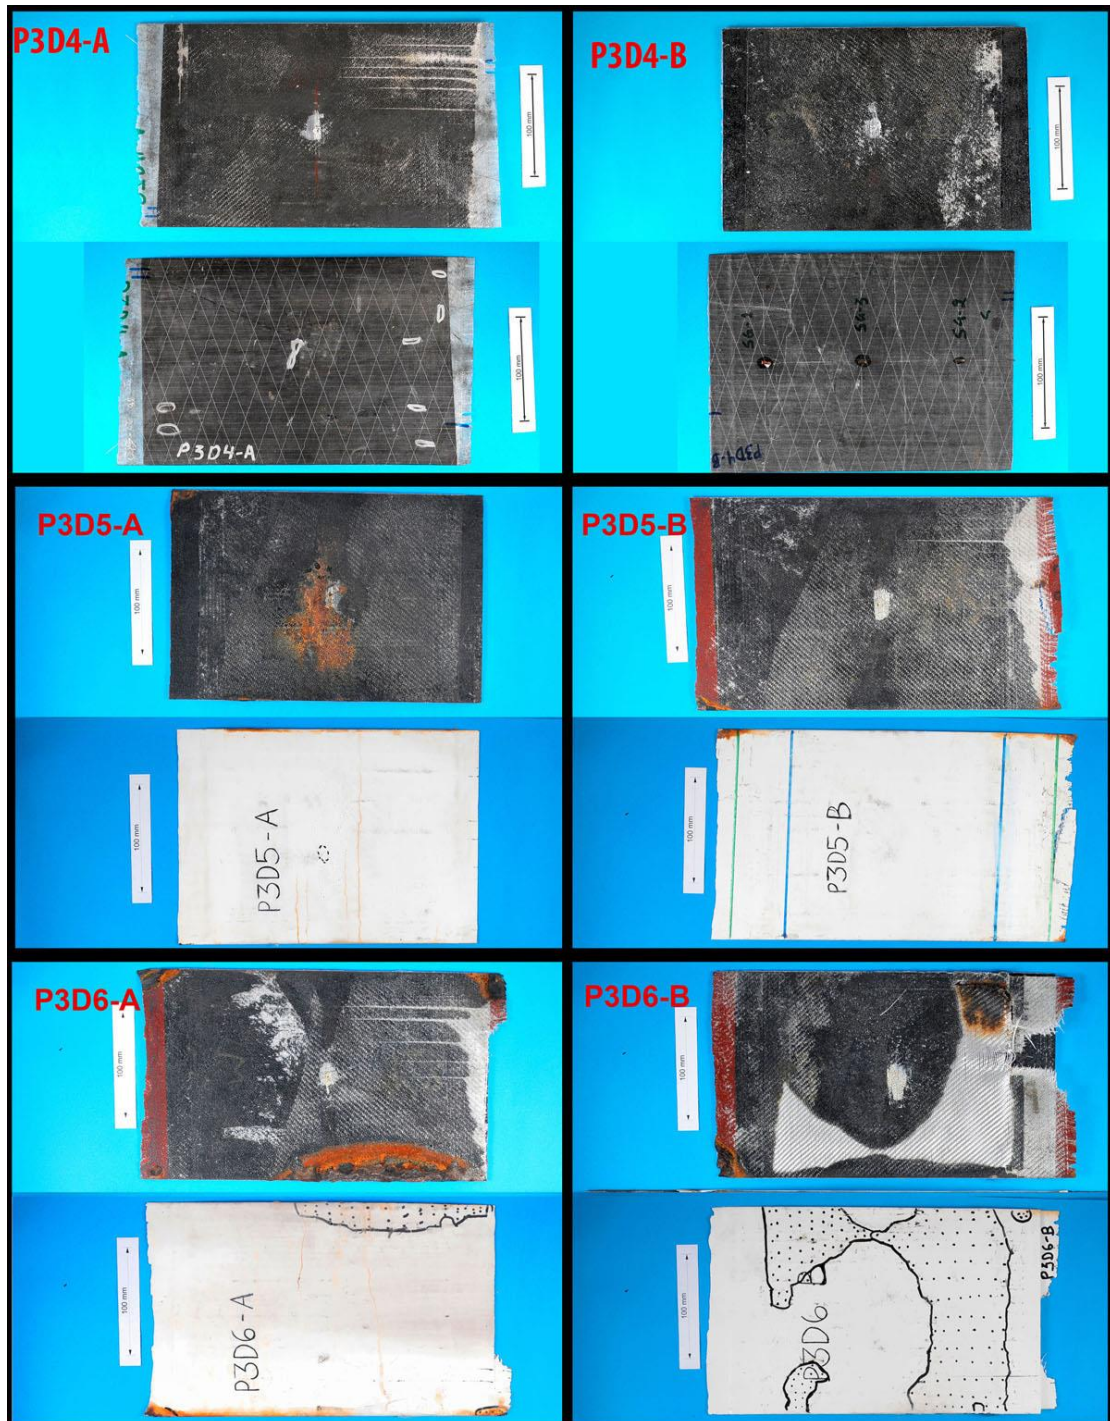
Internal and external patch surfaces of P3 needle gunned specimens. The initial findings were marked on the external surfaces.
